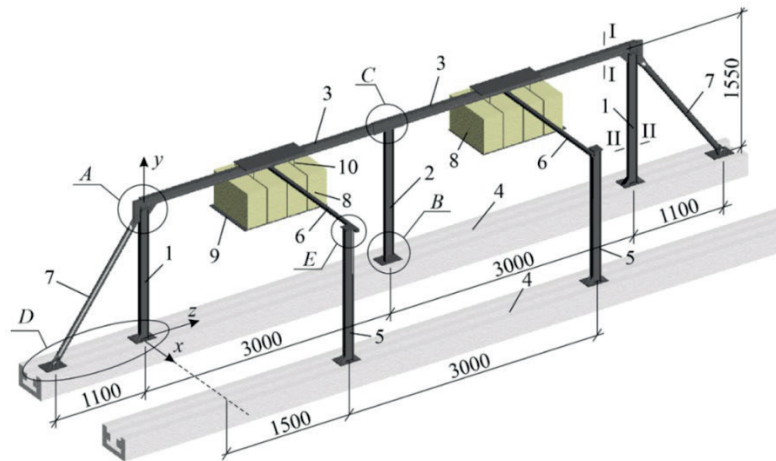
Specimen of the framed structure with rigid joints: 1 - end columns, 2 - middle (removable) column, 3 - beams, 4 - power floor, 5 - additional columns, 6 - beams, 7 - tie rods, 8 - load blocks, 9 - support plates, 10 - studs; A-E marking of joints; I-I, II-II - cross-sections for measuring values of stress-strain state
